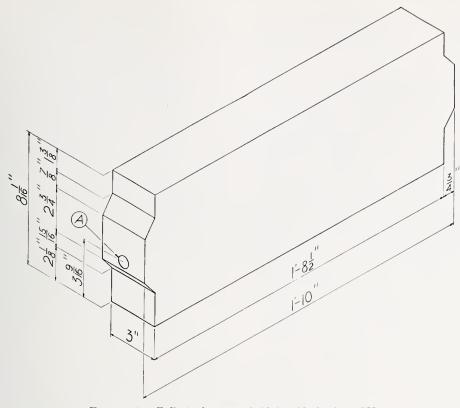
Full-sized precast bridging block, floor CY. A, pipe insert.
